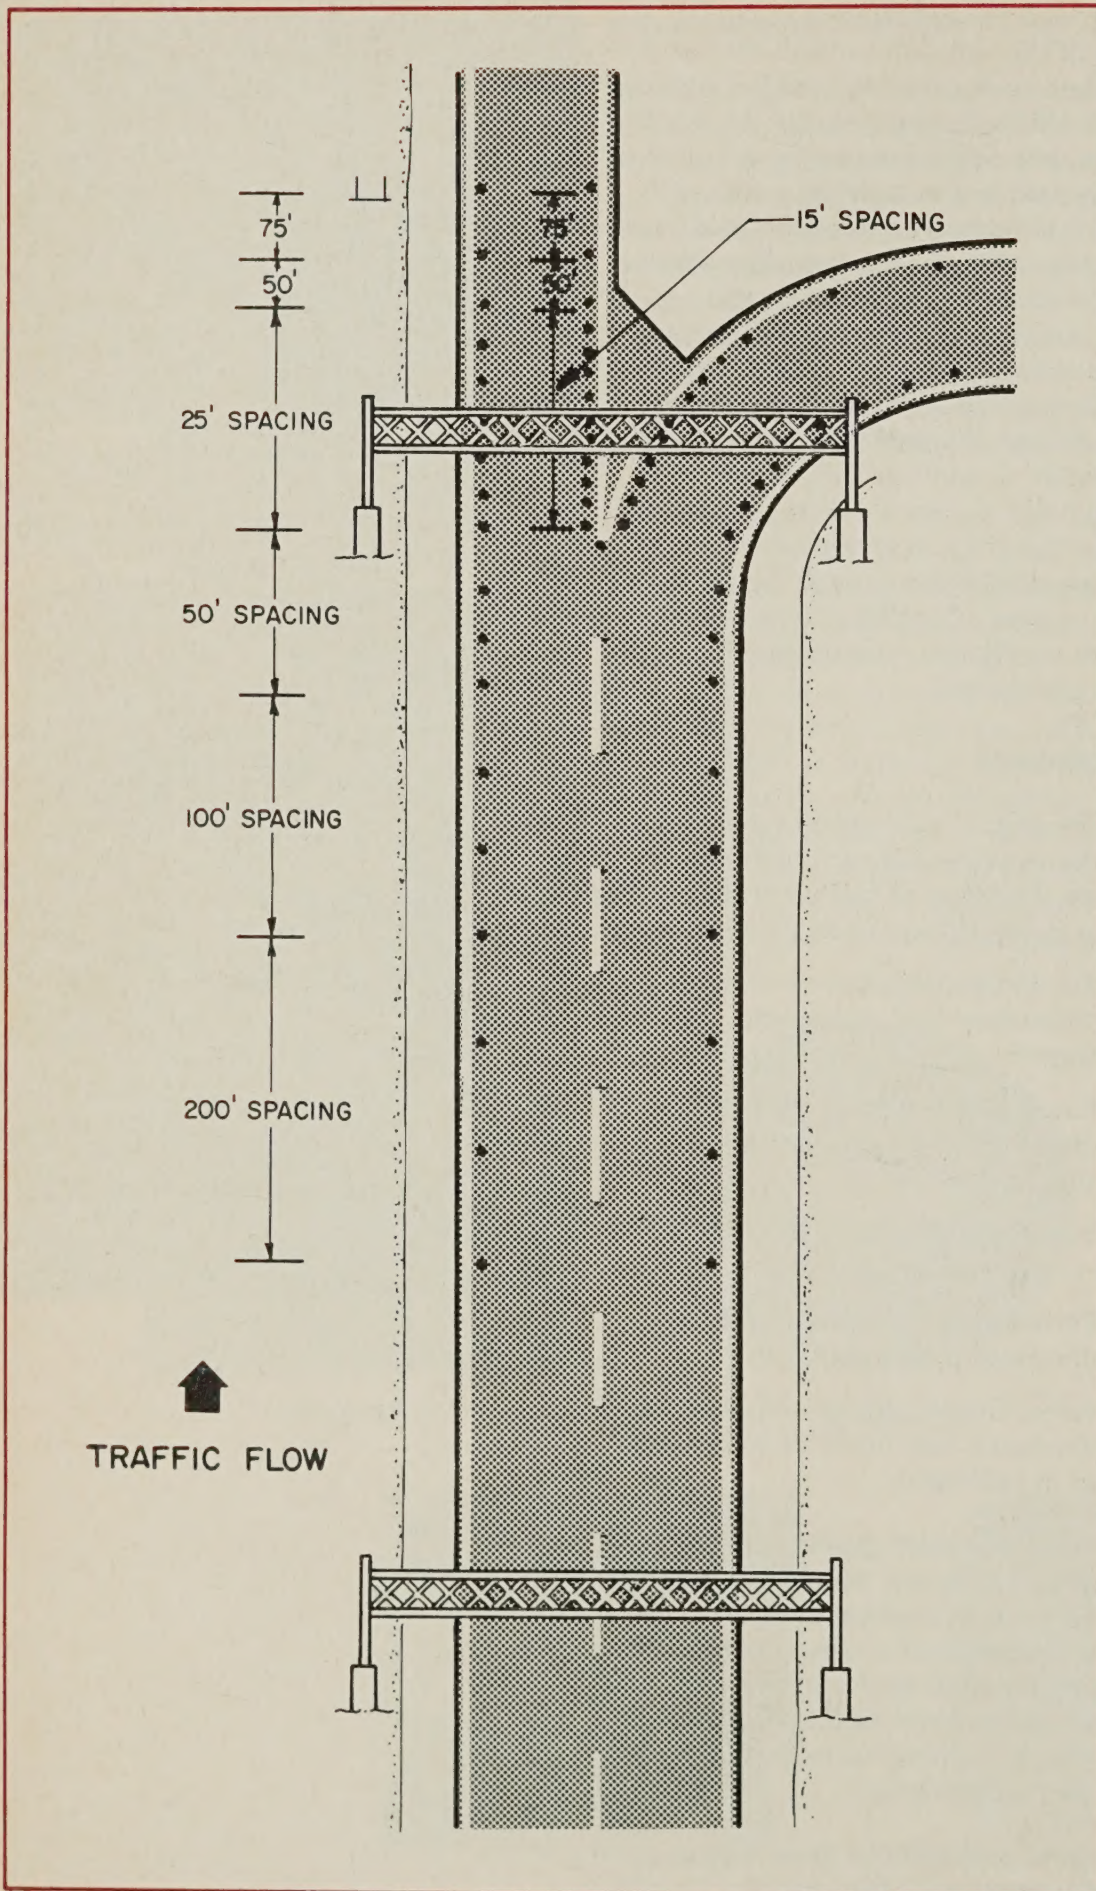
Arrangement of raised pavement markers at I-75 northbound—I-64 eastbound lane split east of Lexington.
